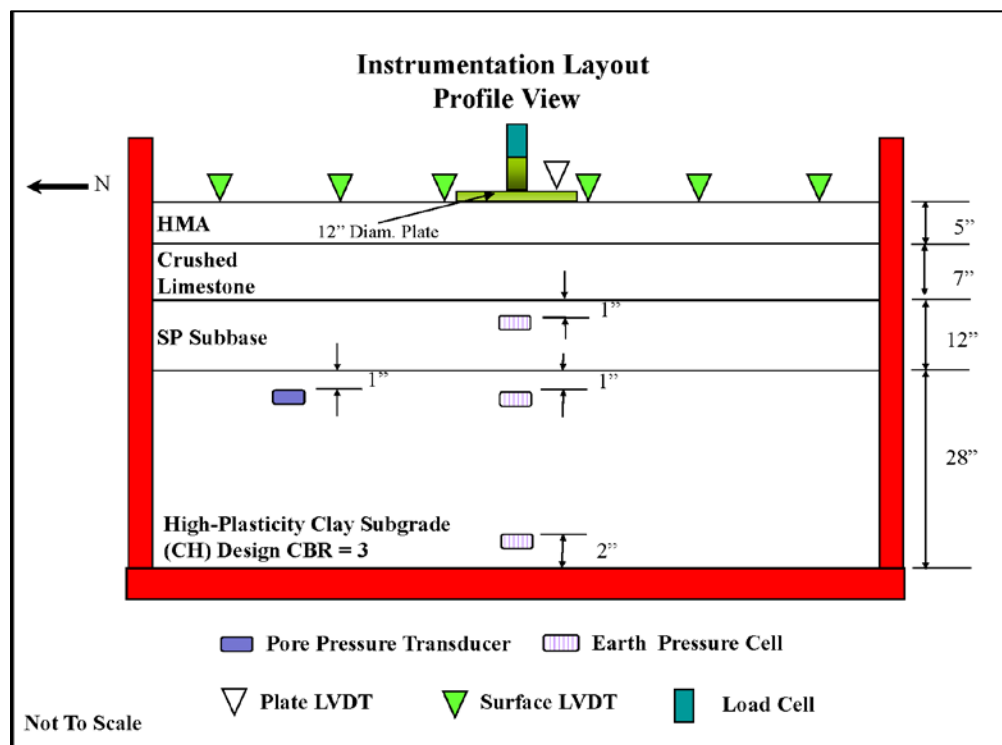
Pavement Sensors for a Typical Test Item, Profile View
